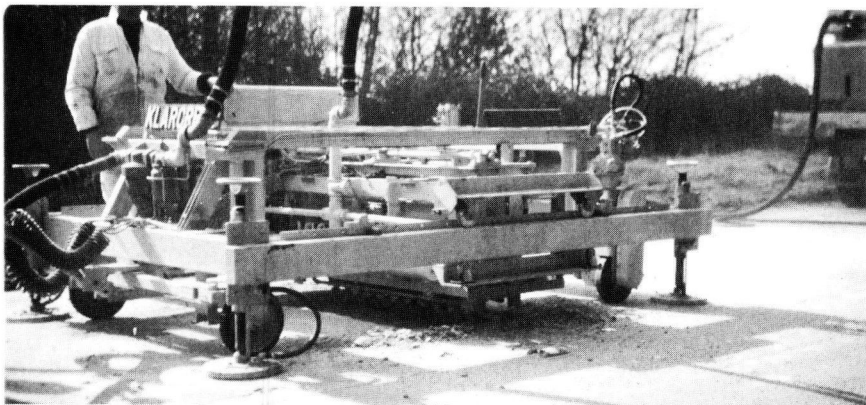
Percussive cutter used to make a partial-depth cut in concrete pavement.
